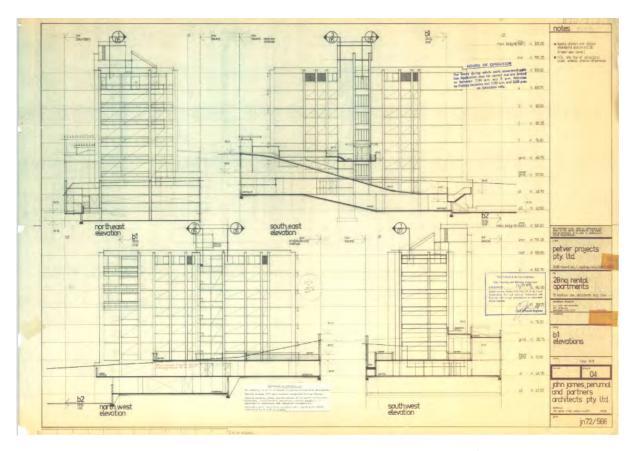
Submitted architectural drawings, Building 1, elevations, 1972. (Source: City of Sydney Archives, A-00590018)
